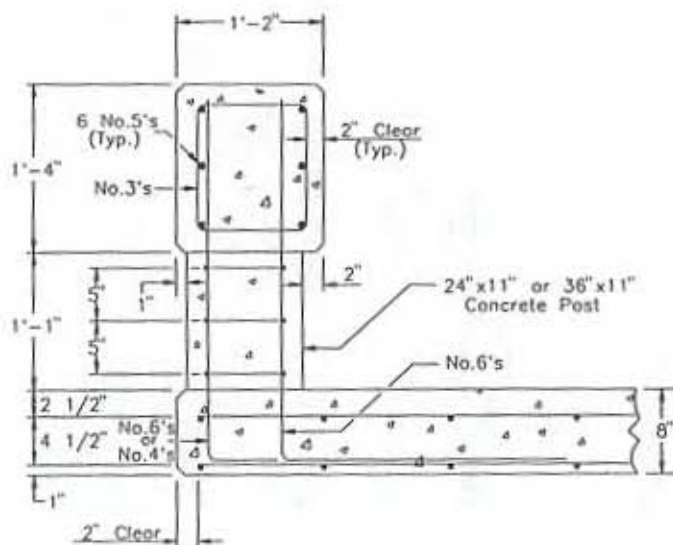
Layout and Design of the Nebraska Open Concrete Bridge Rail
